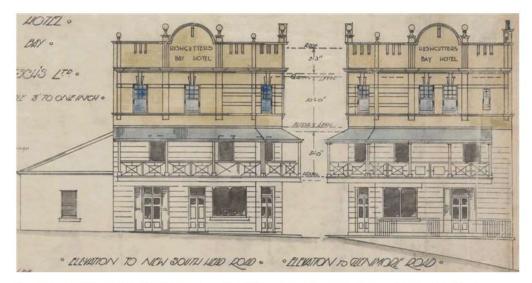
Detail of New South Head Road (L) and Glenmore Road (R) elevations, "Rushcutter [sic] Bay Hotel, New South Head Road, Paddington, Design of additions and alterations, basement and ground floor plan, front elevation, elevation to New South Head Road and section, Applicant/owner, Reschs Limited, Architect M Rigden, 70 Hunter Street, Sydney, Signed 30 March 1911" (Source: State Records and Archives Authority
